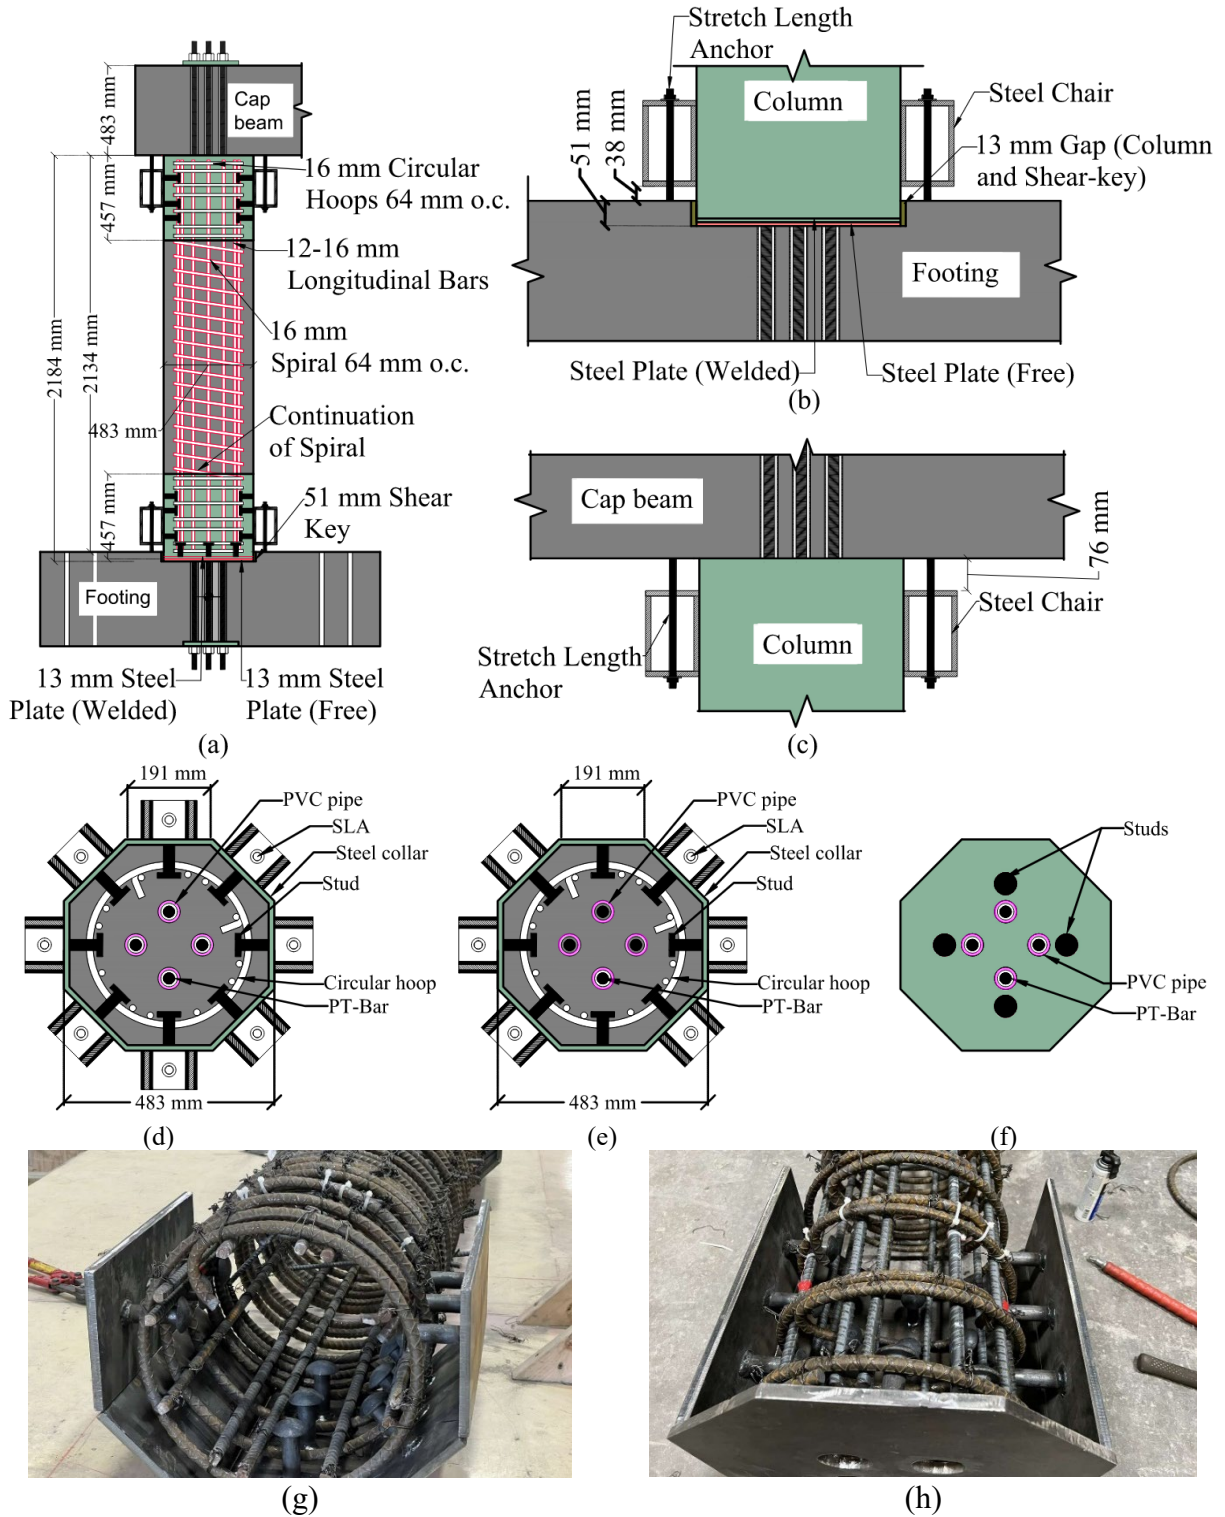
Column details: (a) elevation; (b) connection at footing; (c) connection at cap beam; (d) collar cross-section at footing; (e) collar cross section at cap beam; (f) steel plate at column base; (g) steel collar and studs at cap beam; and (h) steel collar, studs and bottom plate at footing.
